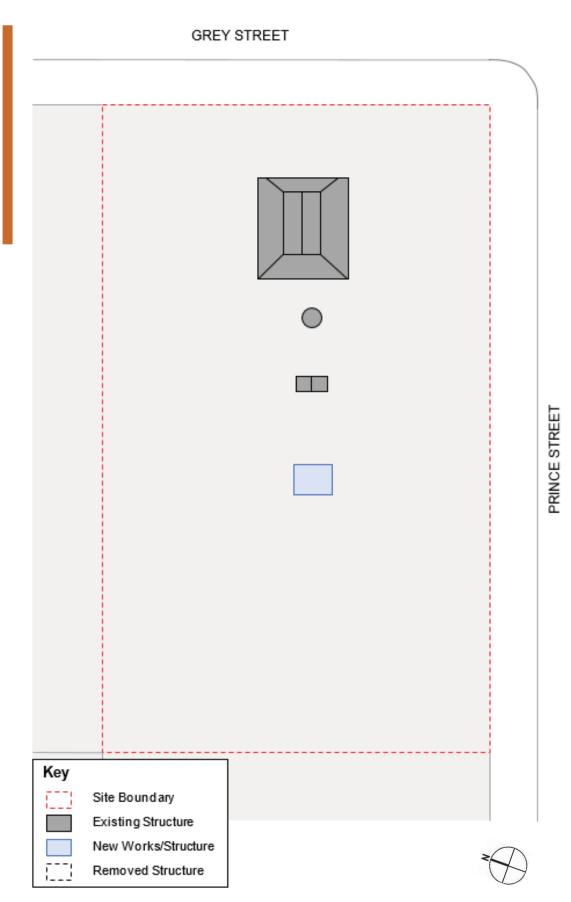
Clarence Town Courthouse and site period of construction - 1871
